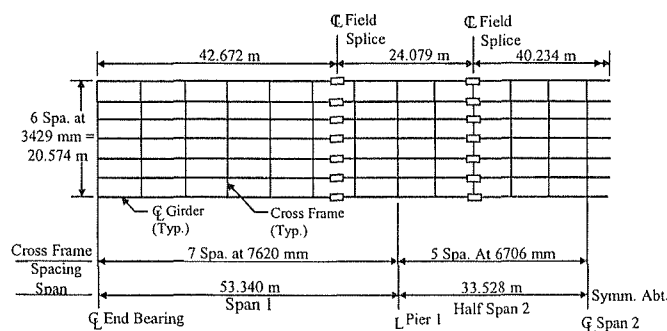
Girder framing plan (adapted from Clingenpeel and Barth 2003)
